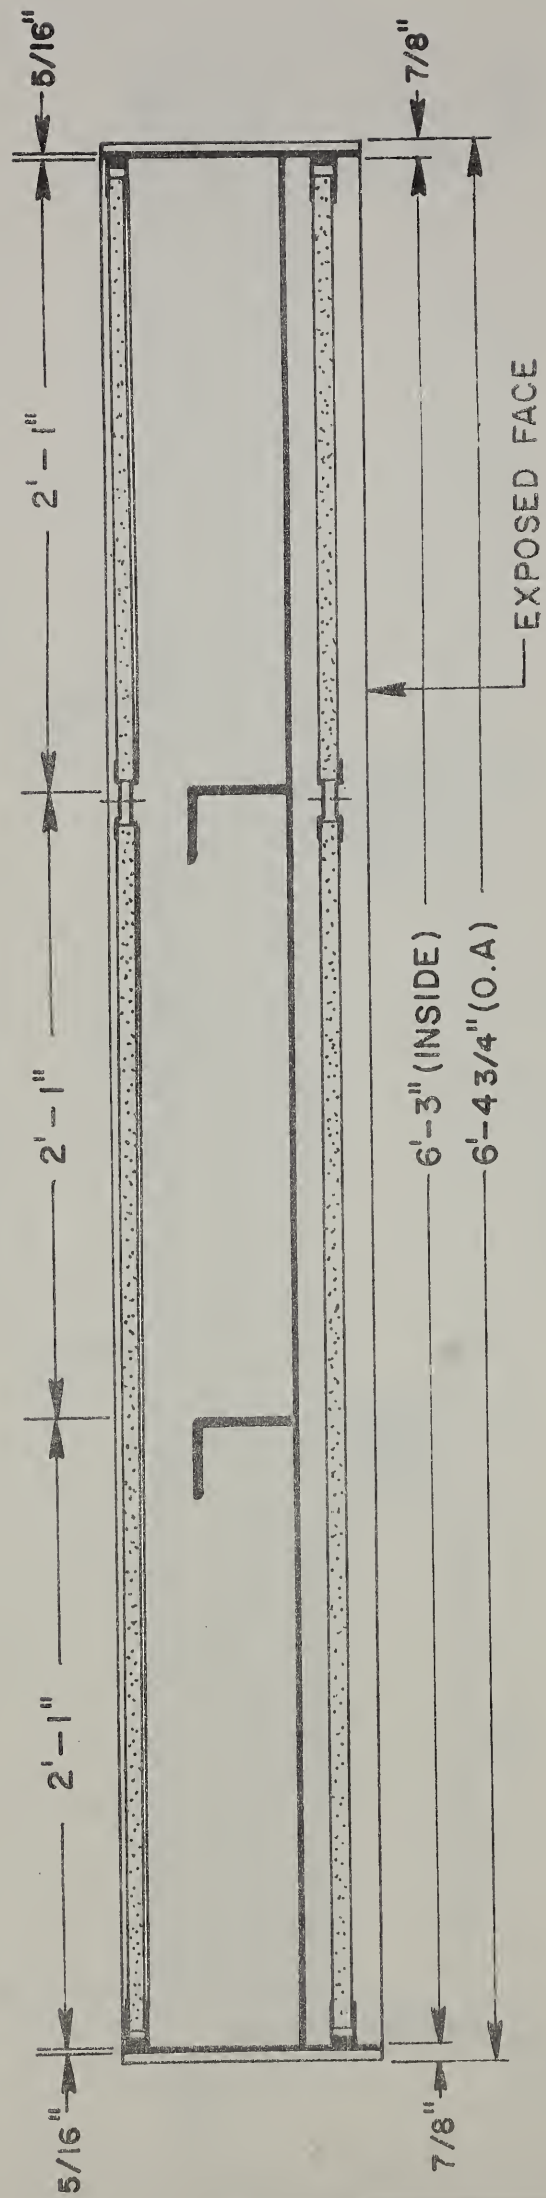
HORIZONTAL CROSS SECTION OF ASSEMBLY 2-B
